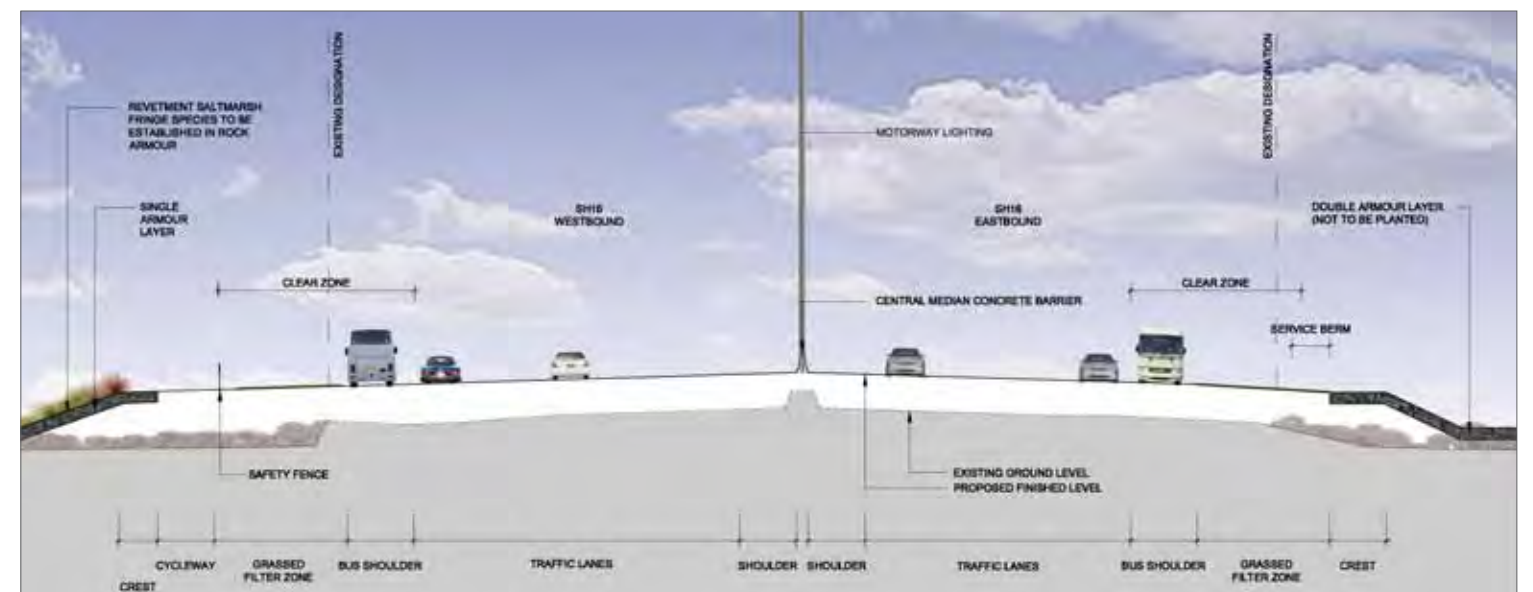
Future cross-section of causeway compared to existing arrangement (Section E)
